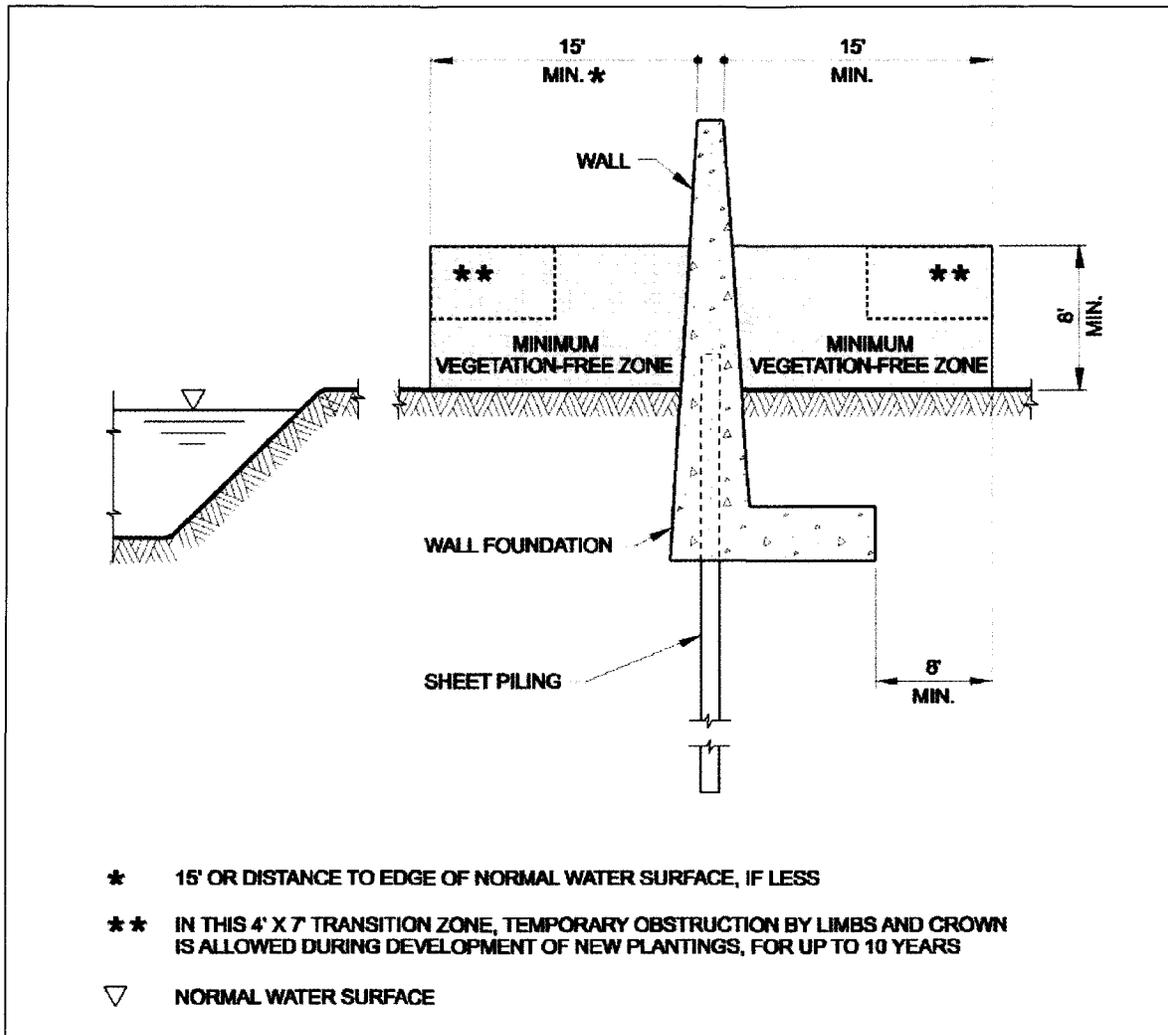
Cantilever-I Type Sheet-Piling Floodwall.
